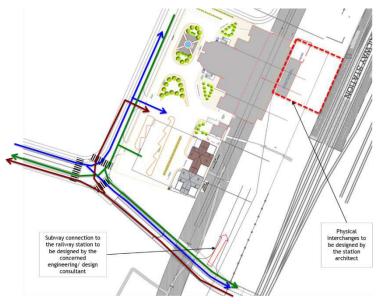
PROPOSED ENTRY/ EXIT TO METRO STATION
